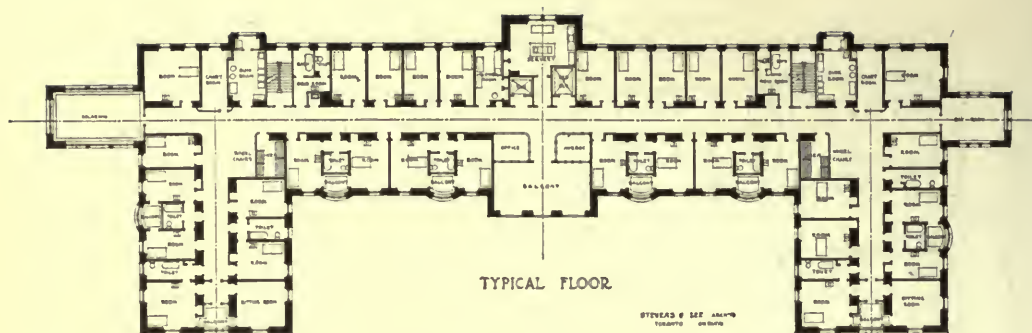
AND 51. FLOOR PLANS—BARRE (VERMONT)
